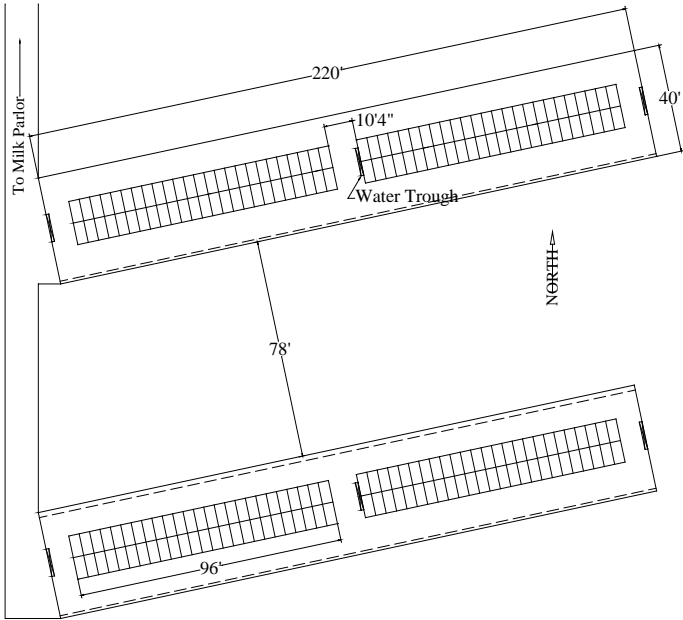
Layout of 2-row freestall buildings and location of water troughs.
